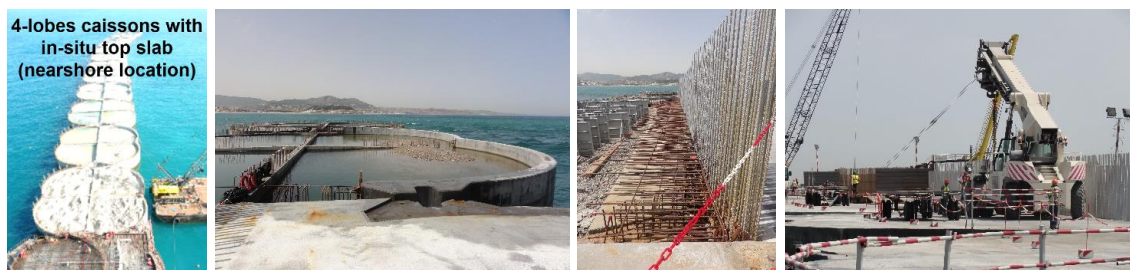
In-situ top slab and crest wall achievement, proscribed due to remote location
